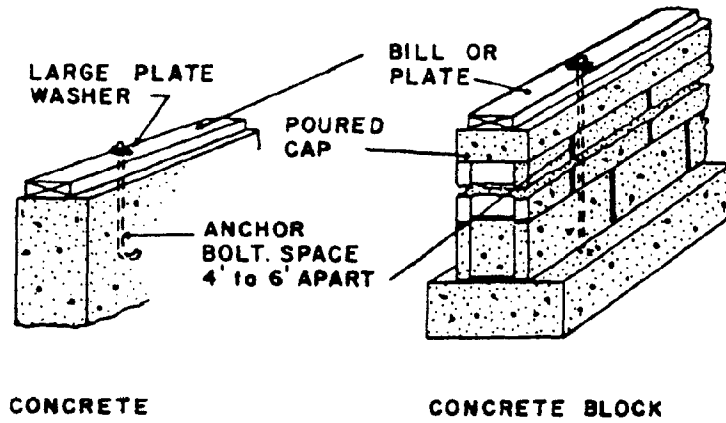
Anchoring wood sill or plate to foundation. From Reference (15).
